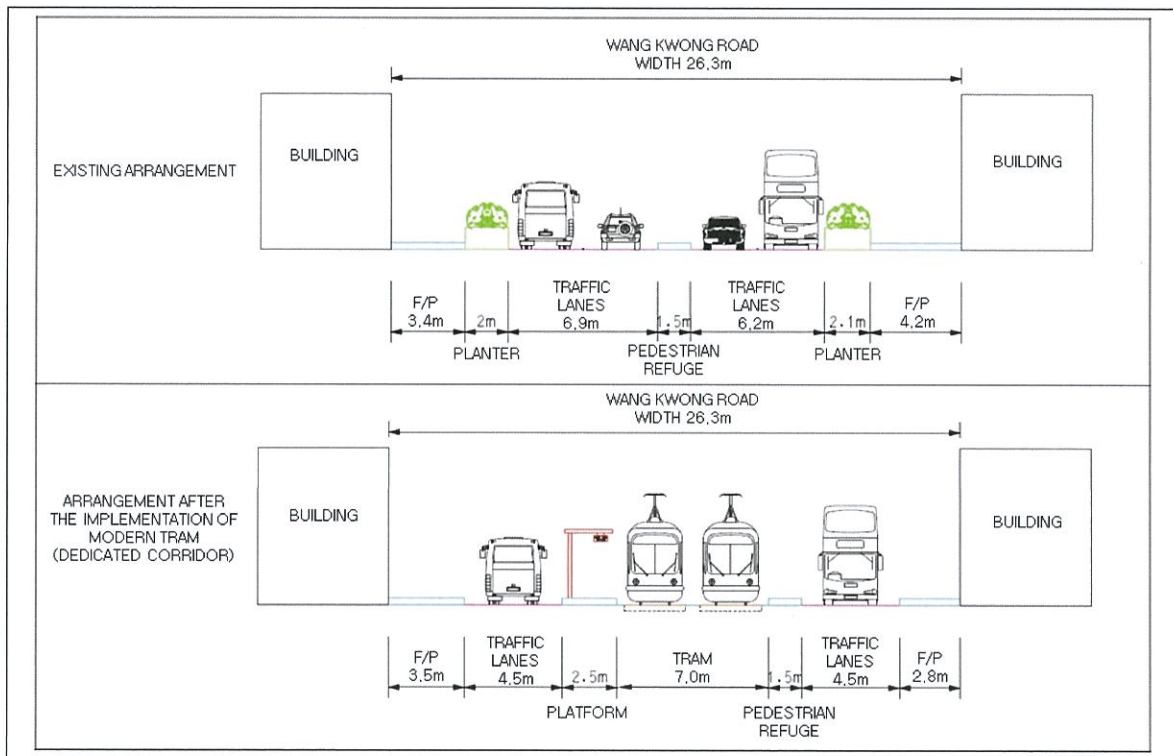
Typical Cross Section Plan of for Option 1 (At-Grade Dedicated Corridor) on Wang Kwong Road (Before and After Implementation)
